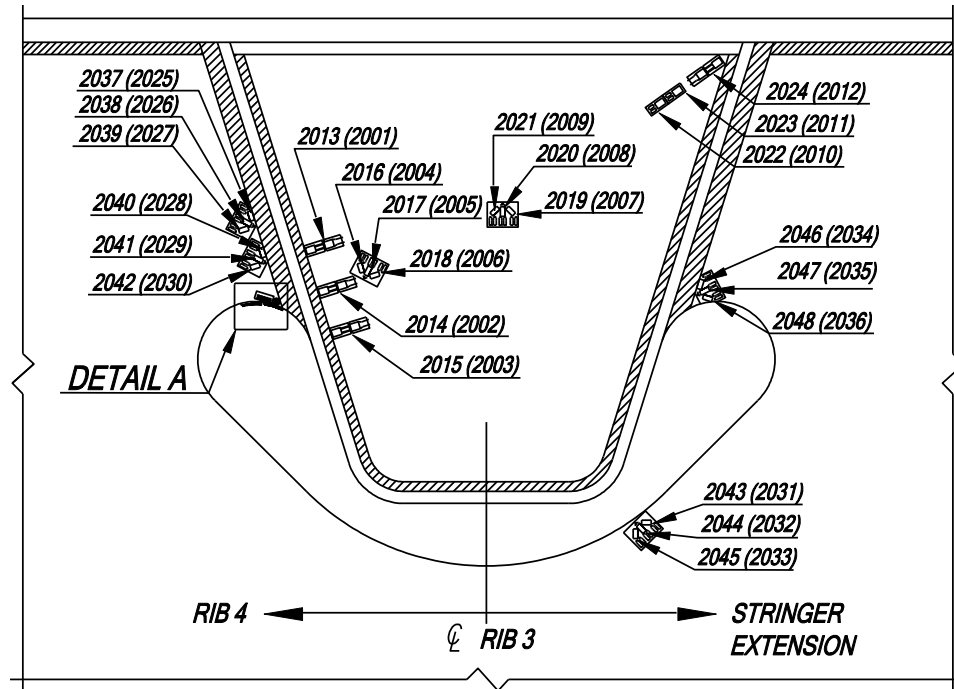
Detail instrumentation plan at Rib 3 – Detail E in Figure 78 (drawn by Alapati)
